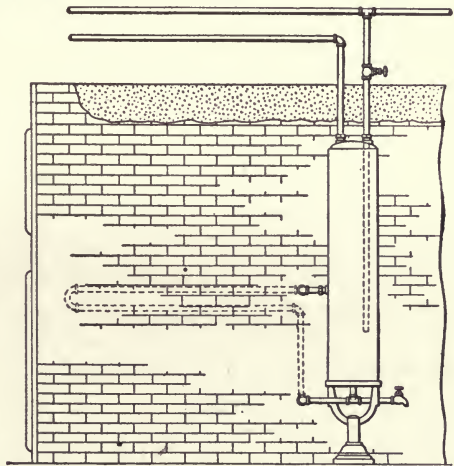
A Bakery Boiler Heated by Coil in Oven.
